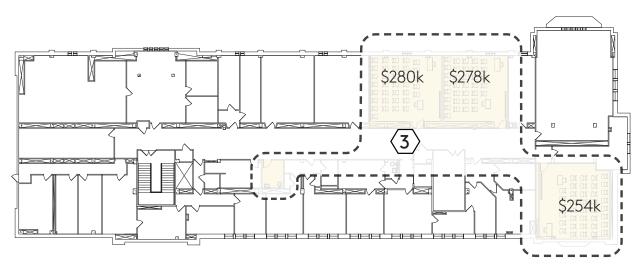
Phasing options overlaid on Smith Hall floor plans
